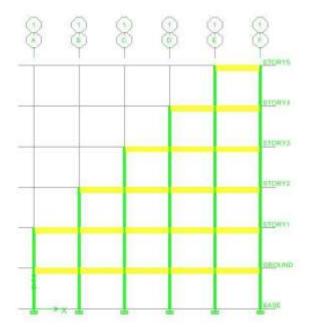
Elevation of setback building for five storey model (00 slope)
